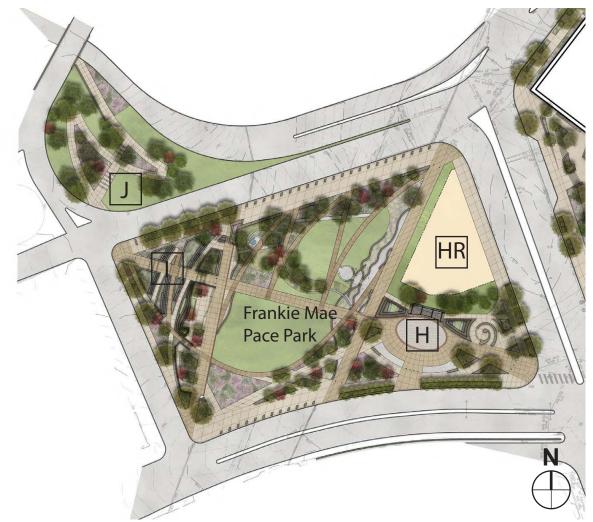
Enlarged illustrative plan showing a small adjacent pavilion /restaurant with an outdoor dining terrace, pylon marking the entry plaza, and a tree-lined promenade.
